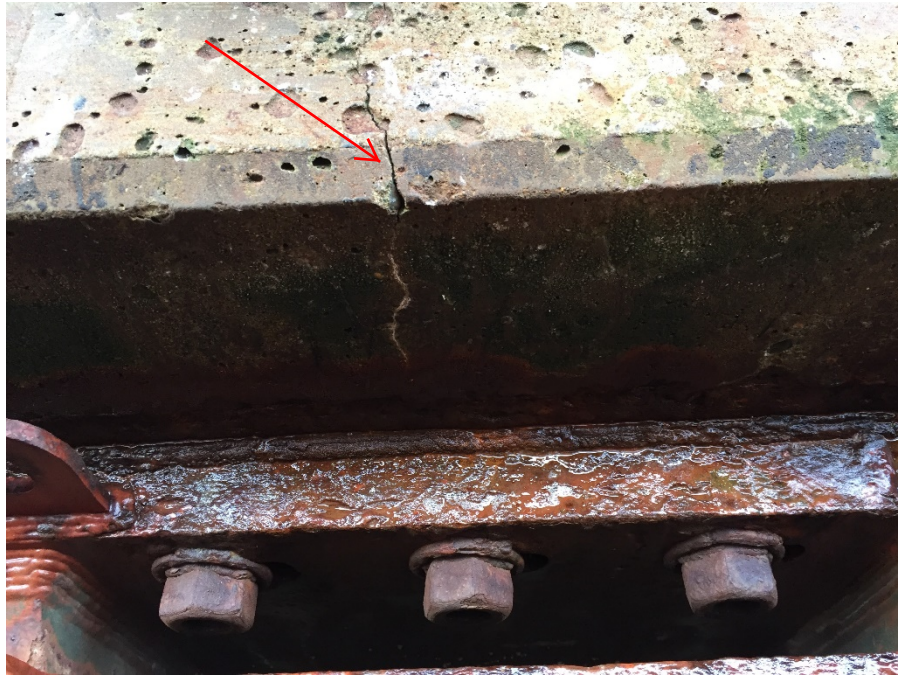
View of typical crack in concrete extending from gripper plate at dolphin (D2).
